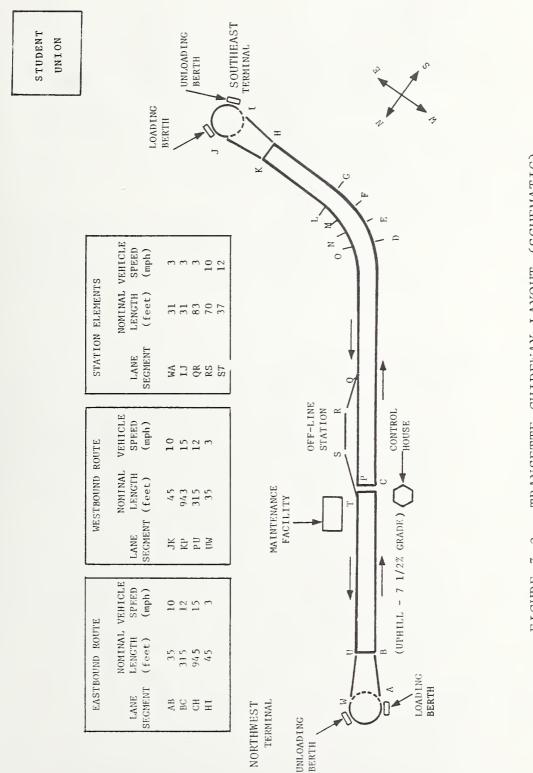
TRANSETTE GUIDEWAY LAYOUT (SCHEMATIC)
